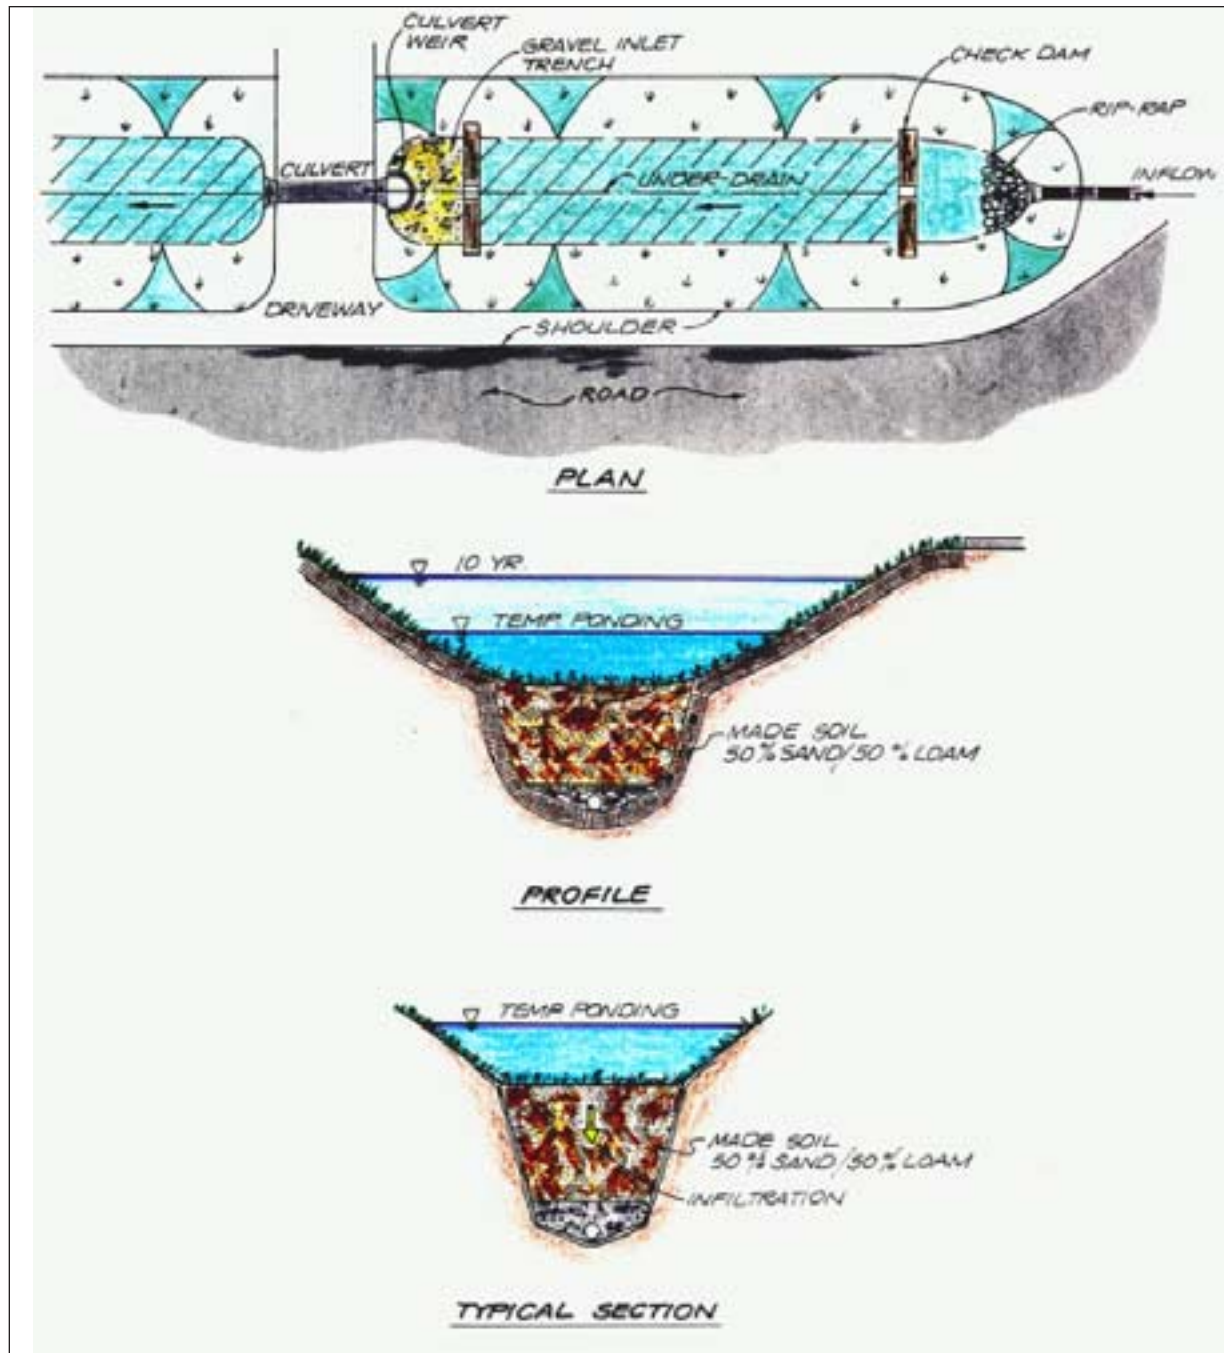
B: Plan and Section of Dry Swale, Source: Claytor & Schueler, 1996
